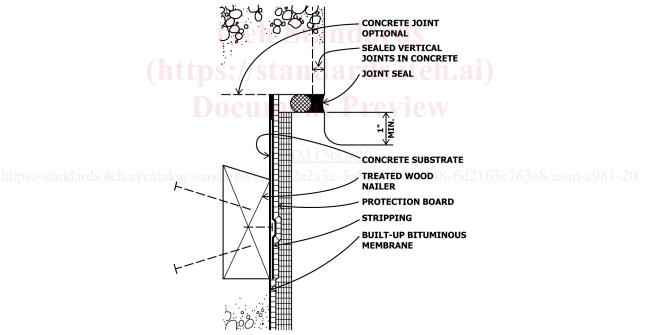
Terminal Condition Above Finish Grade on Concrete Wall (see 8.8.8 and 8.8.8.2)
